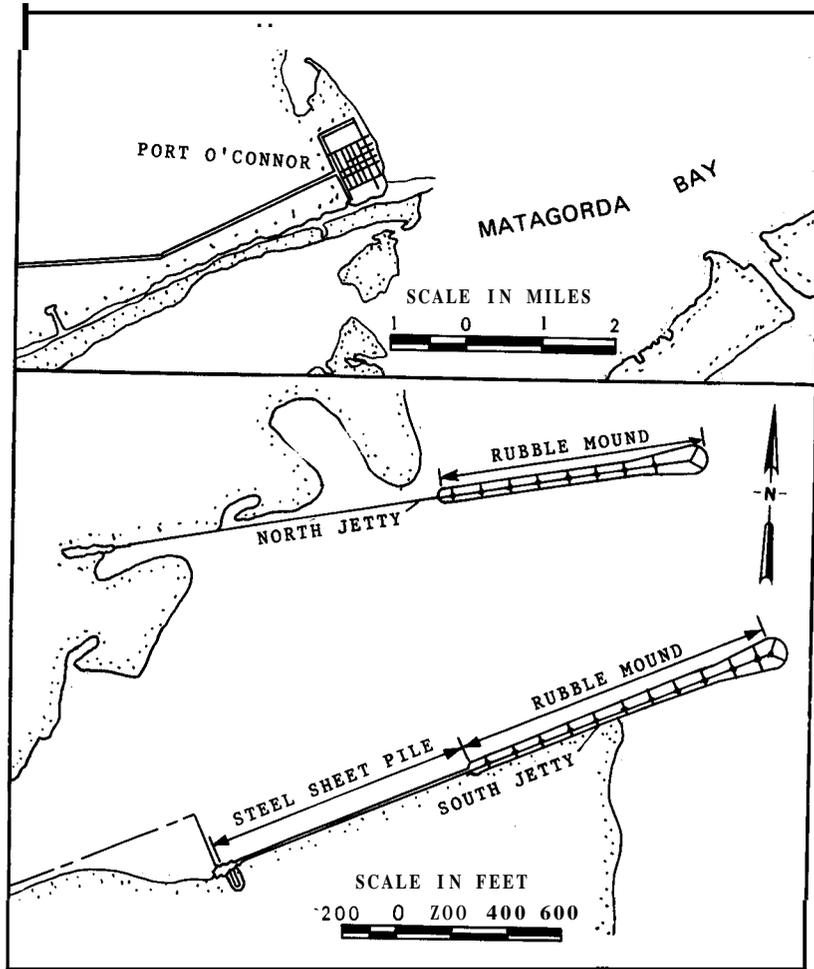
Location, plan view, and typical sections of Port O'Connor jetties
